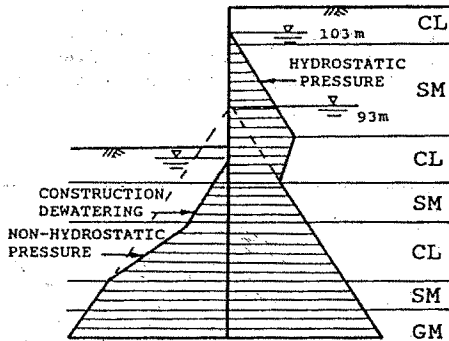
TYPICAL DESIGN WATER PRESSURE PROFILE FOR TYPICAL EXCAVATIONS IN THE T2 ZONE (AFTER WONG ET AL., 1993)
